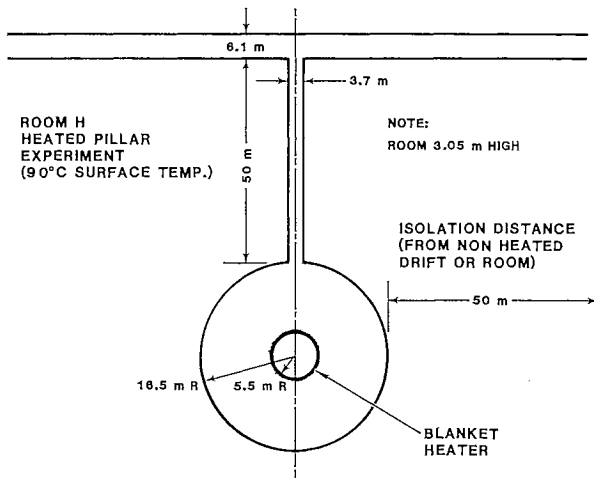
Plan View Schematic of Heated Axisymmetric Pillar Test
